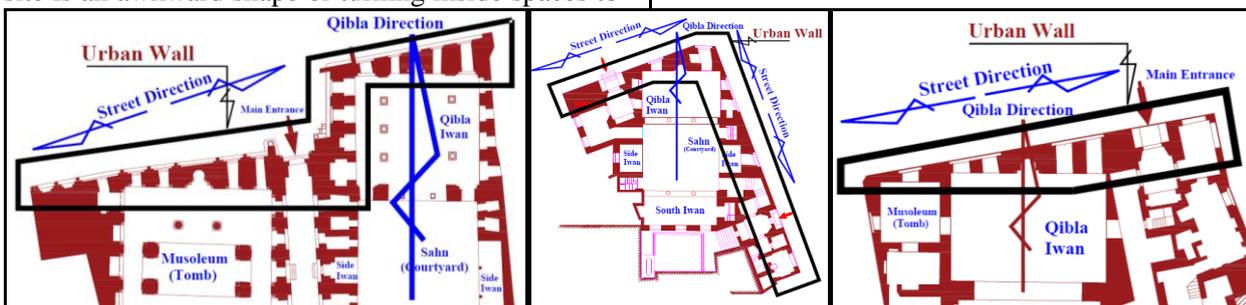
urban wall design in Madrasa buildings, left to right: 1- complex of Sultan Qalawun, 2- Madrasa of Qadi Abu Bakr Muzhir, 3- Al Ashraf Barsbay Madrasa. [Author]
